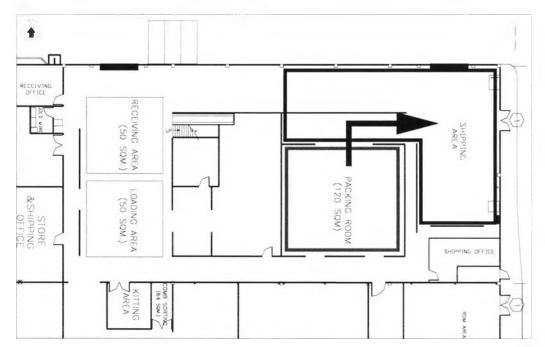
Packing Area outside Cleanroom to Finished Goods Store
